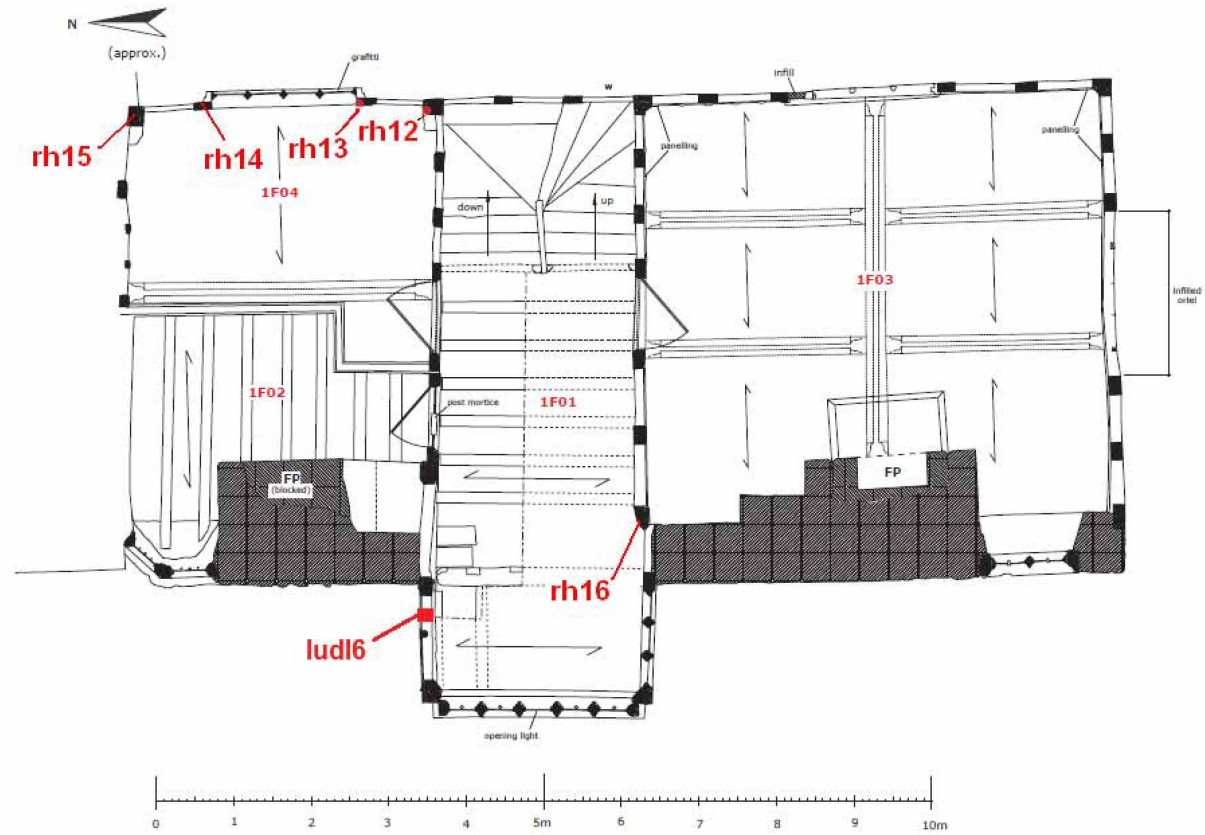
First-floor plan, showing timbers sampled for dendrochronology (after Tyler)
